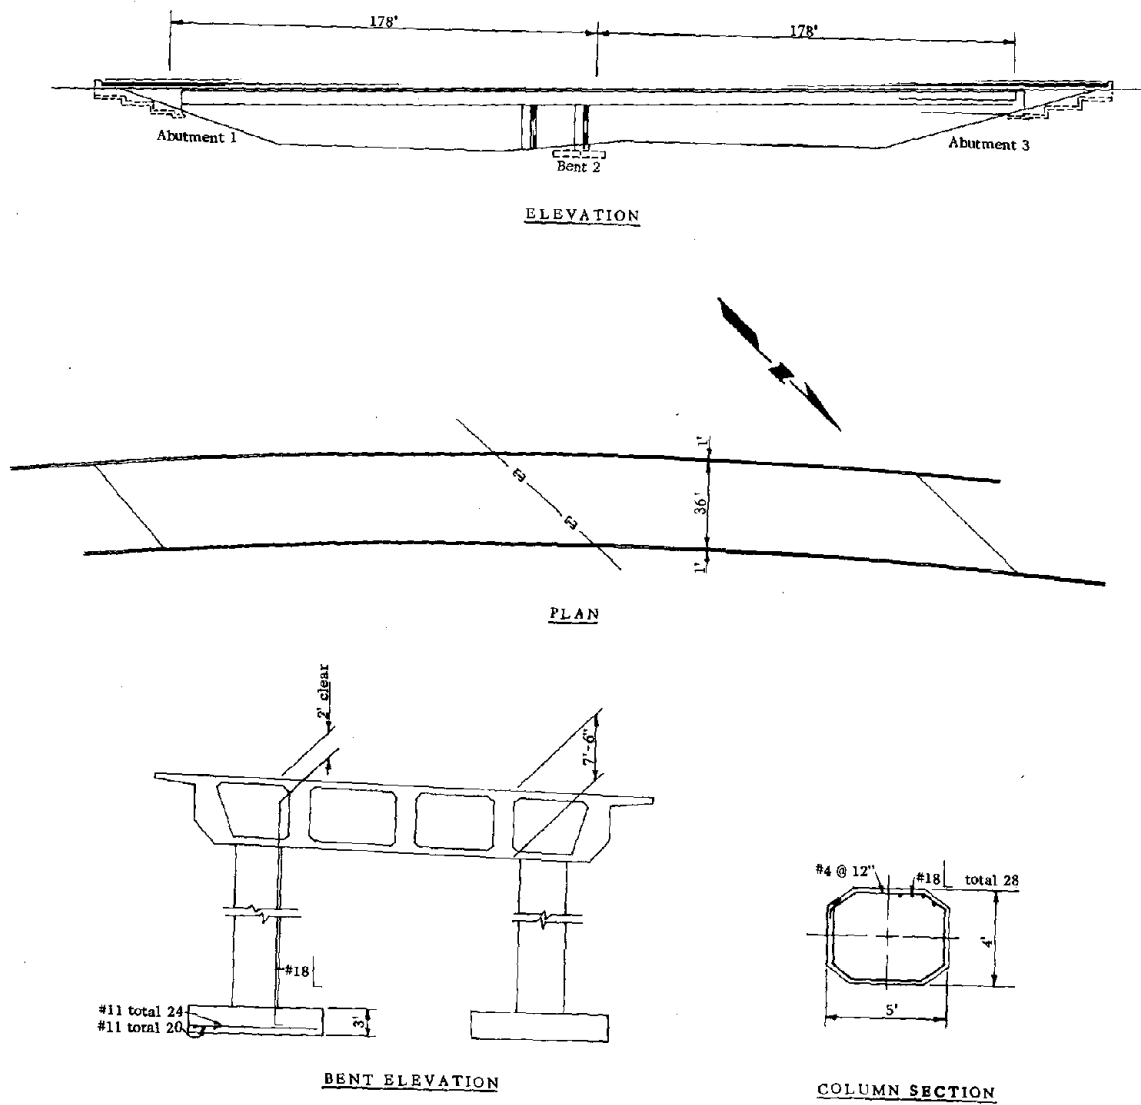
Route 5 (Truck Lane)/405 Separation bridge. Construction details.
